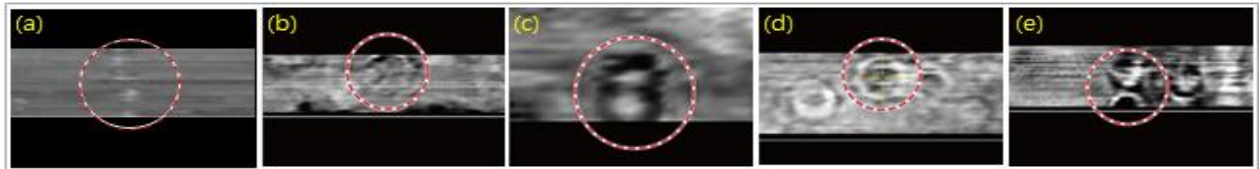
Flat section analysis - (a) Underground pipe, (b) Gravel layer, (c) Underground cavity, (d) Sand layer, (e) PE corrugated pipe
